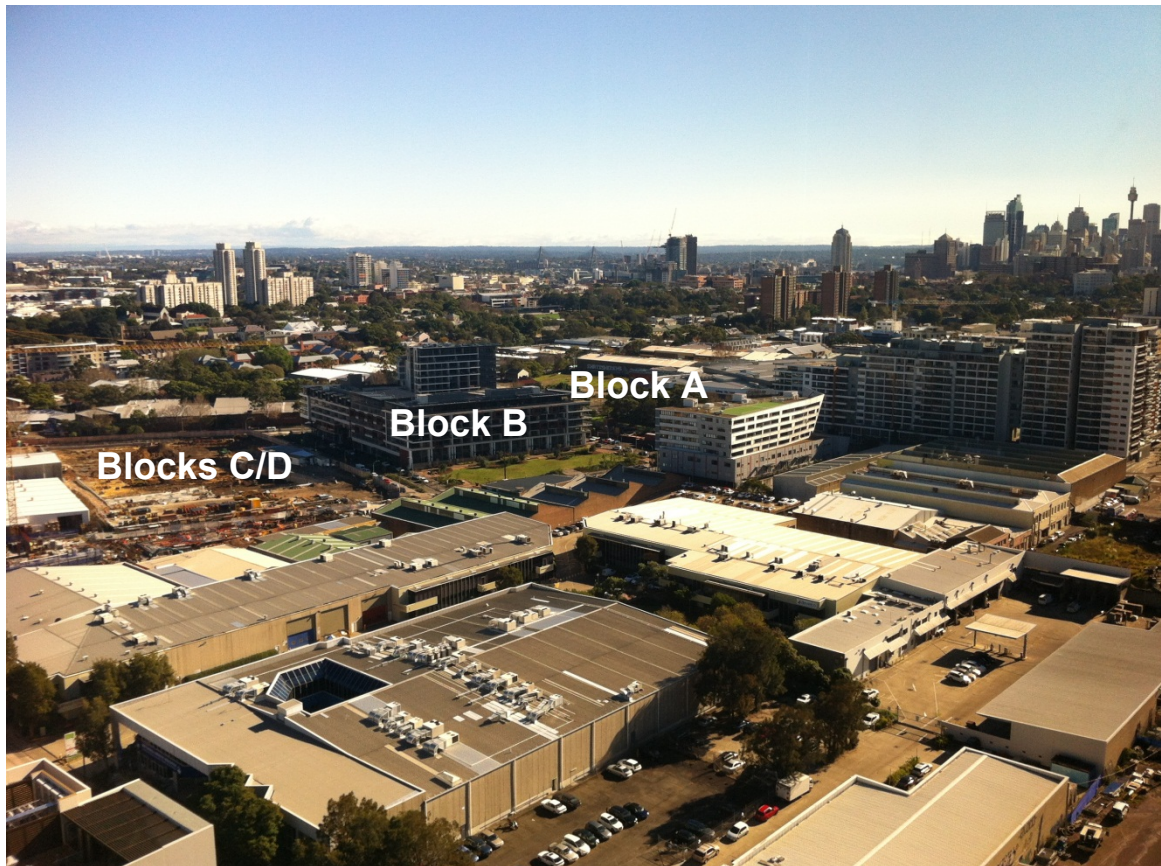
Aerial image of the Lachlan Precinct and greater masterplan site, looking north west.
